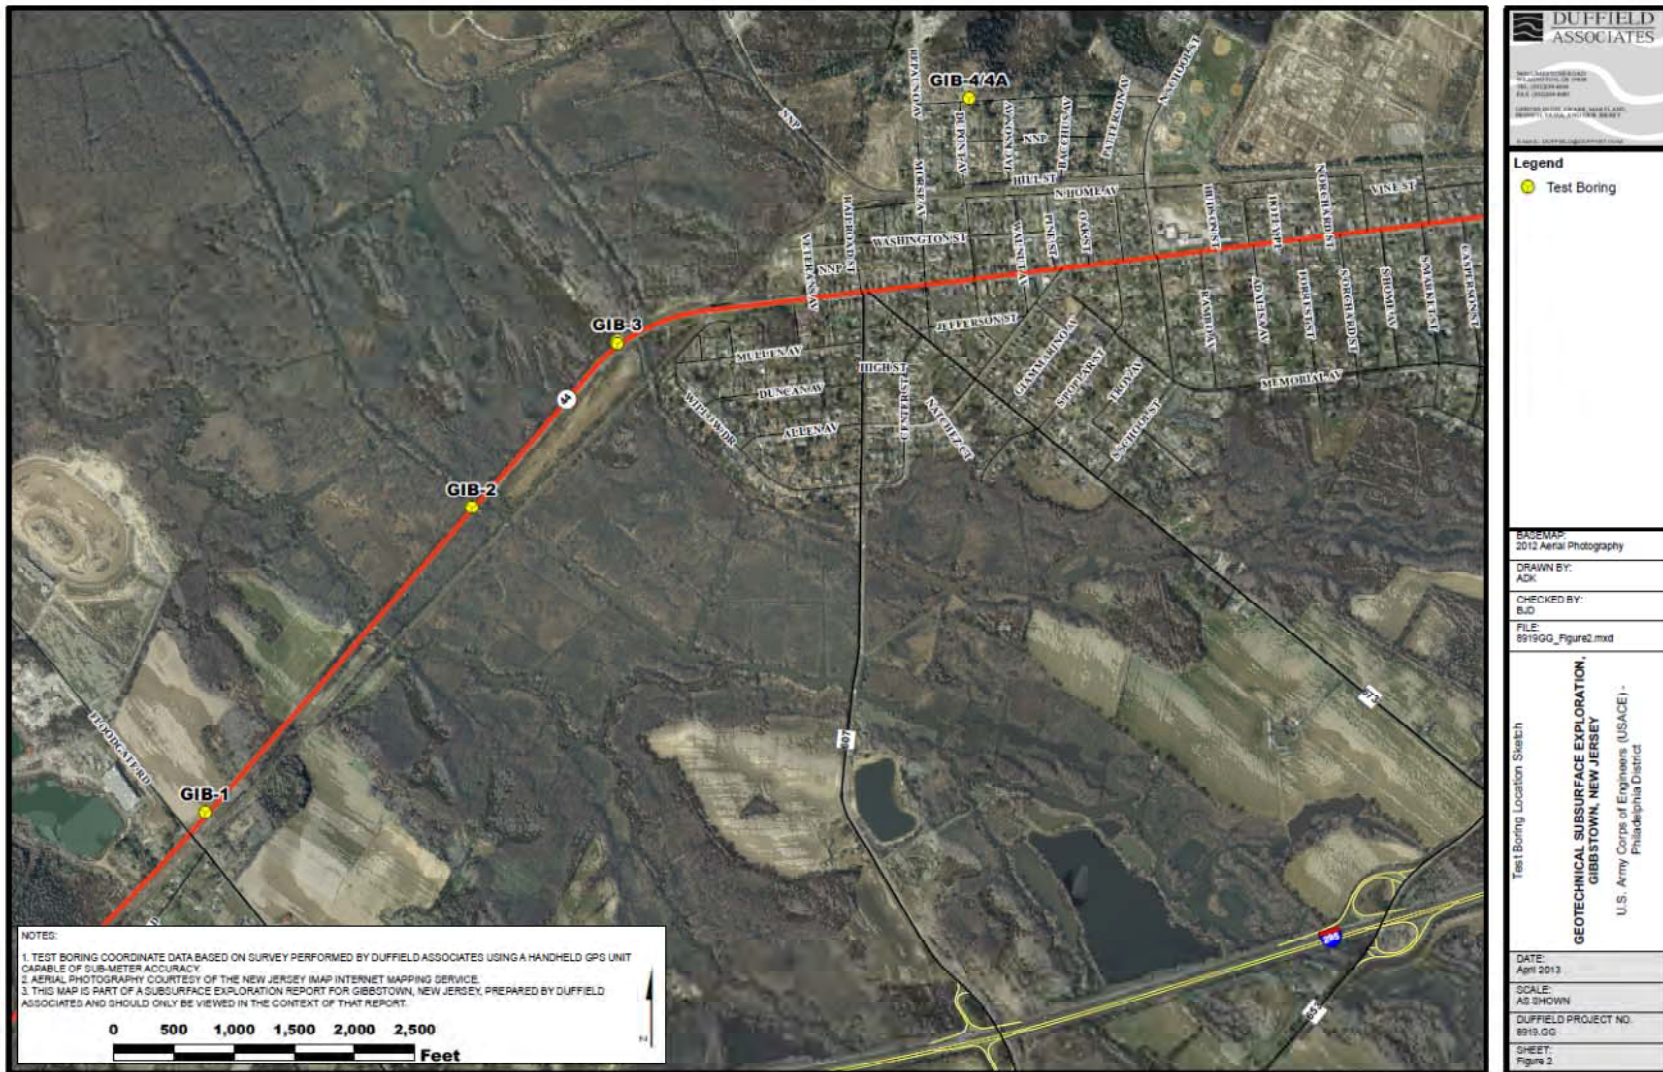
Geotechnical Subsurface Exploration, Gibbstown, New Jersey – Test Boring Location Sketch
